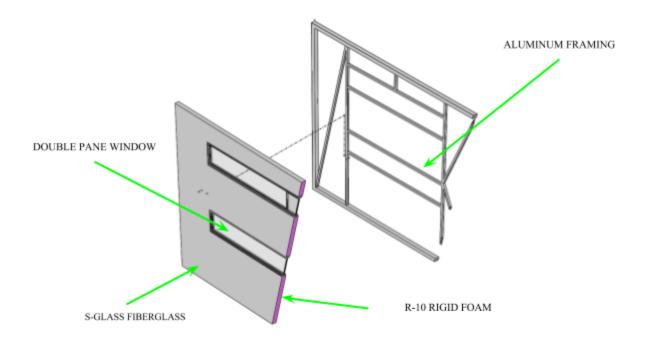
Example of side wall panel composition; other panels have similar composition. This image is of an exploded and sectional cut through components comprised of the panel.
